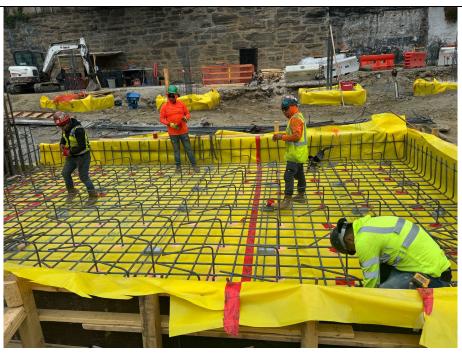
Continued installation of rebar by Raptor Construction in the elevator footing
